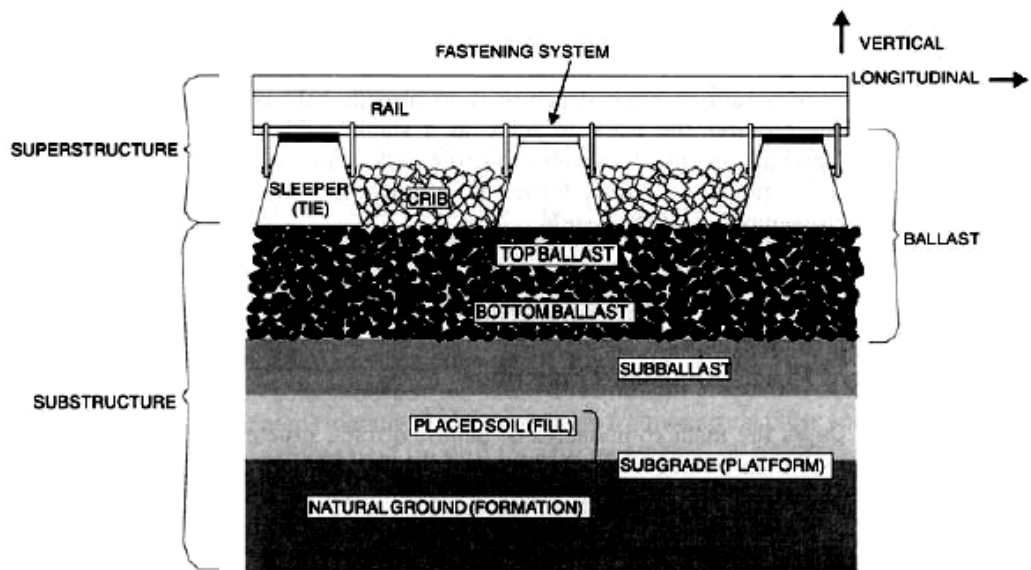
Longitudinal cross section of ballasted track structure (Selig and Waters, 1994)
